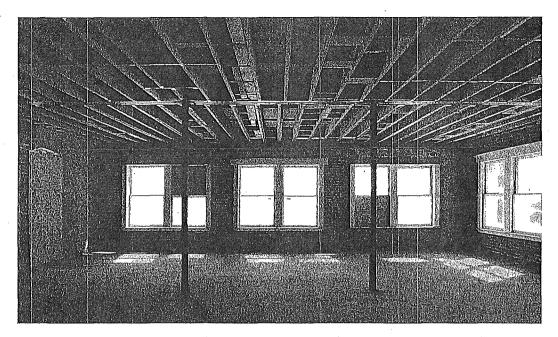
Photograph of typical north interior elevation (photograph taken on 02/27/2018).
